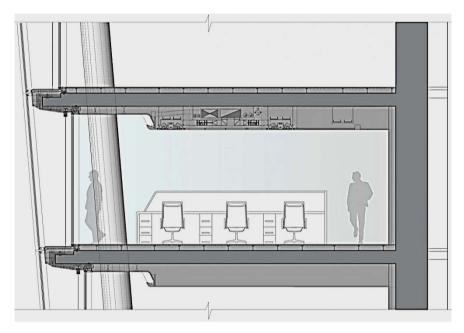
Z.Hadid building. (In redevelopment project CityLife-Milan, Italy) Air conditioning: installation of chilled beams in the ceiling, source [9]
